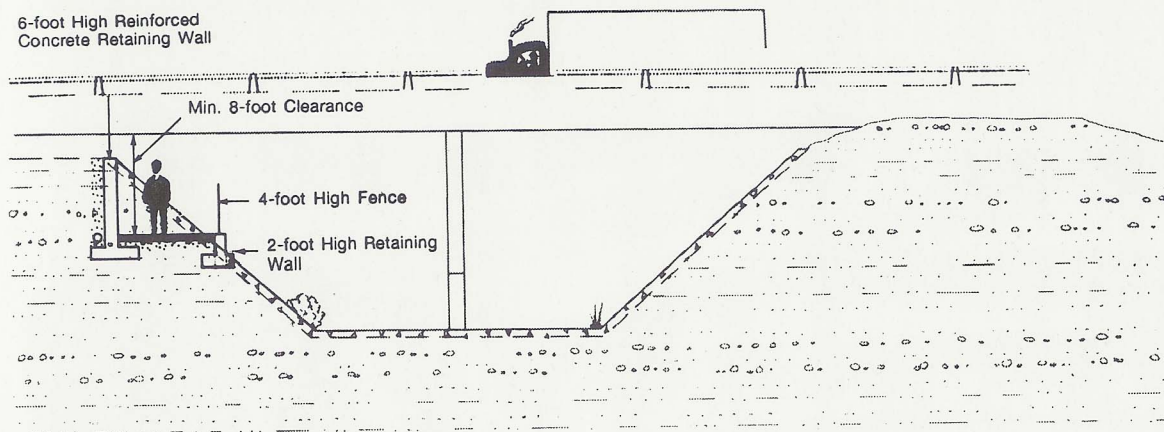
CONCEPTUAL ENGINEERING DESIGN OF HIGHWAY 101 UNDERPASS
